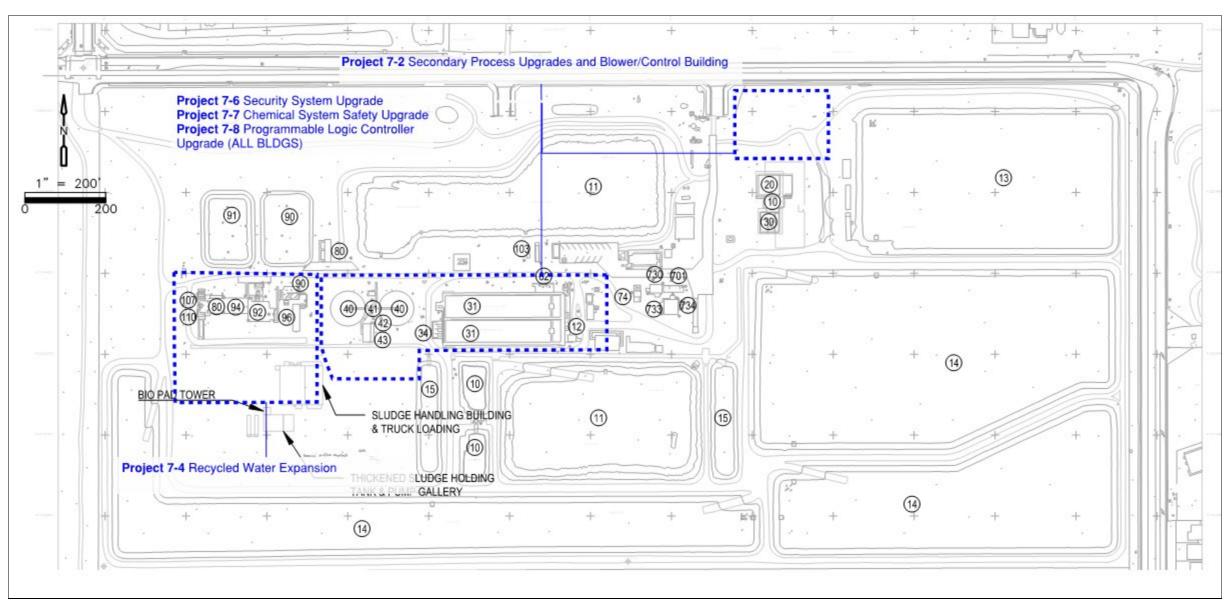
WRP 7 Existing Site Plan and Proposed Improvements
